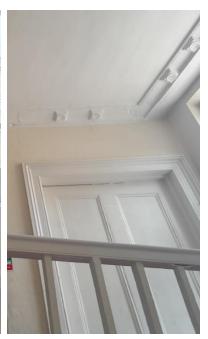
Second floor half landing window which would be removed to provide access to closet wing and proposed location of lift in Option 1.
